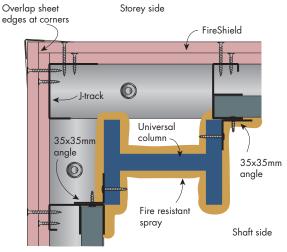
Shaft Wall Intersecting Column Detail Plan view
